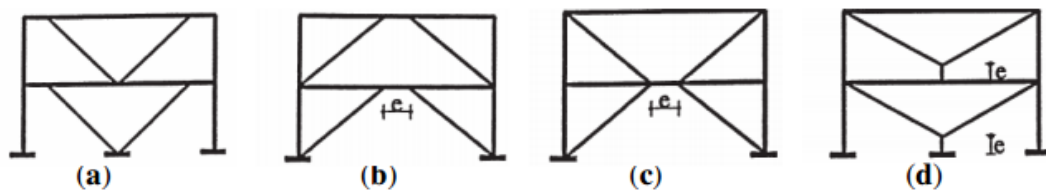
Various types of eccentrically steel bracing frames. (a) V-bracing, (b) K-bracing, (c) X-bracing, (d) Y-bracing[17]
